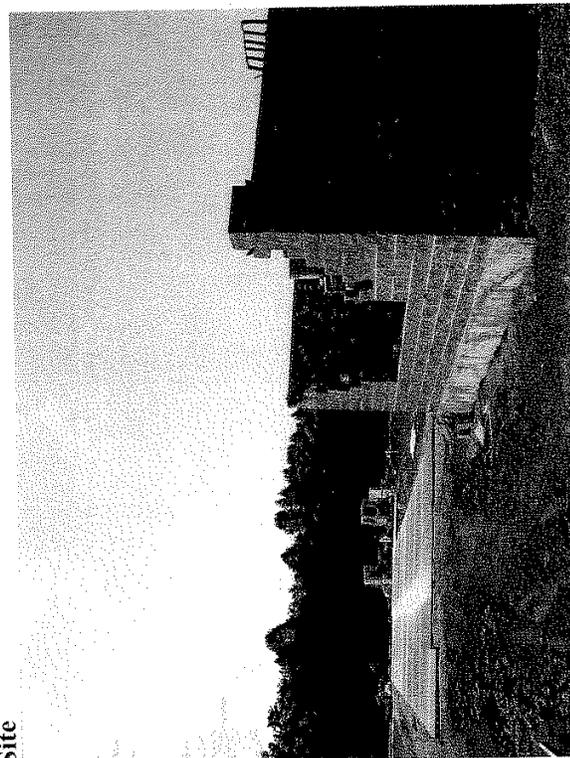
Construction of Bleachers & Field House South of Monitoring Site
